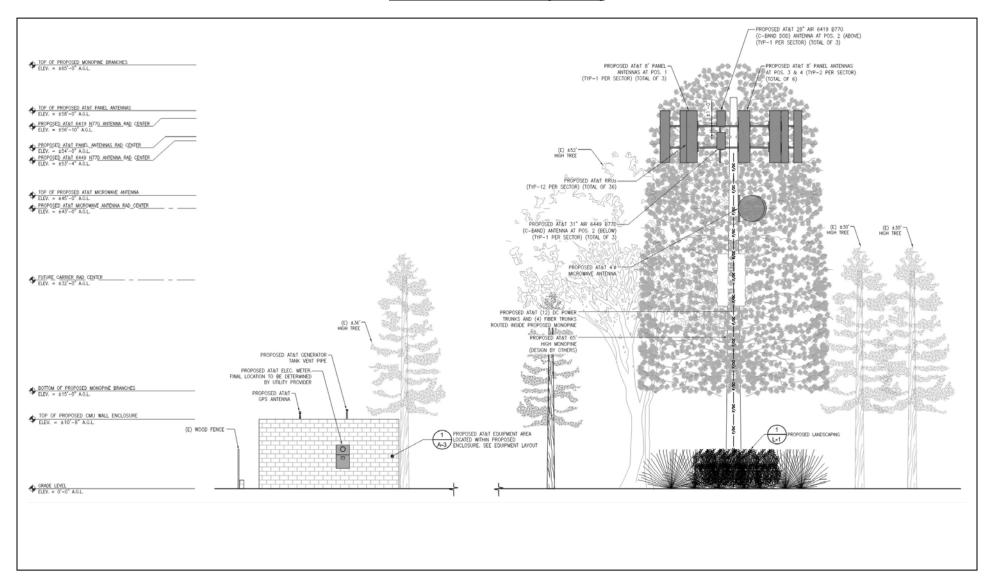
Exhibit D: ELEVATIONS (NORTH - CONTINUED)
